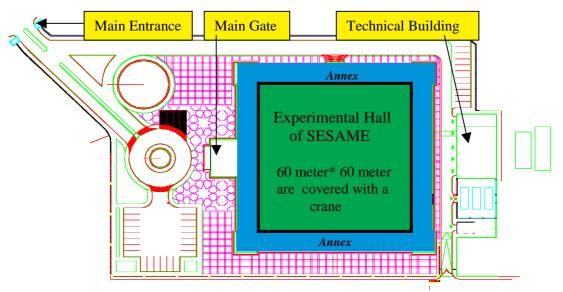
The general Layout of the building with main gate, main entrance and the technical building
